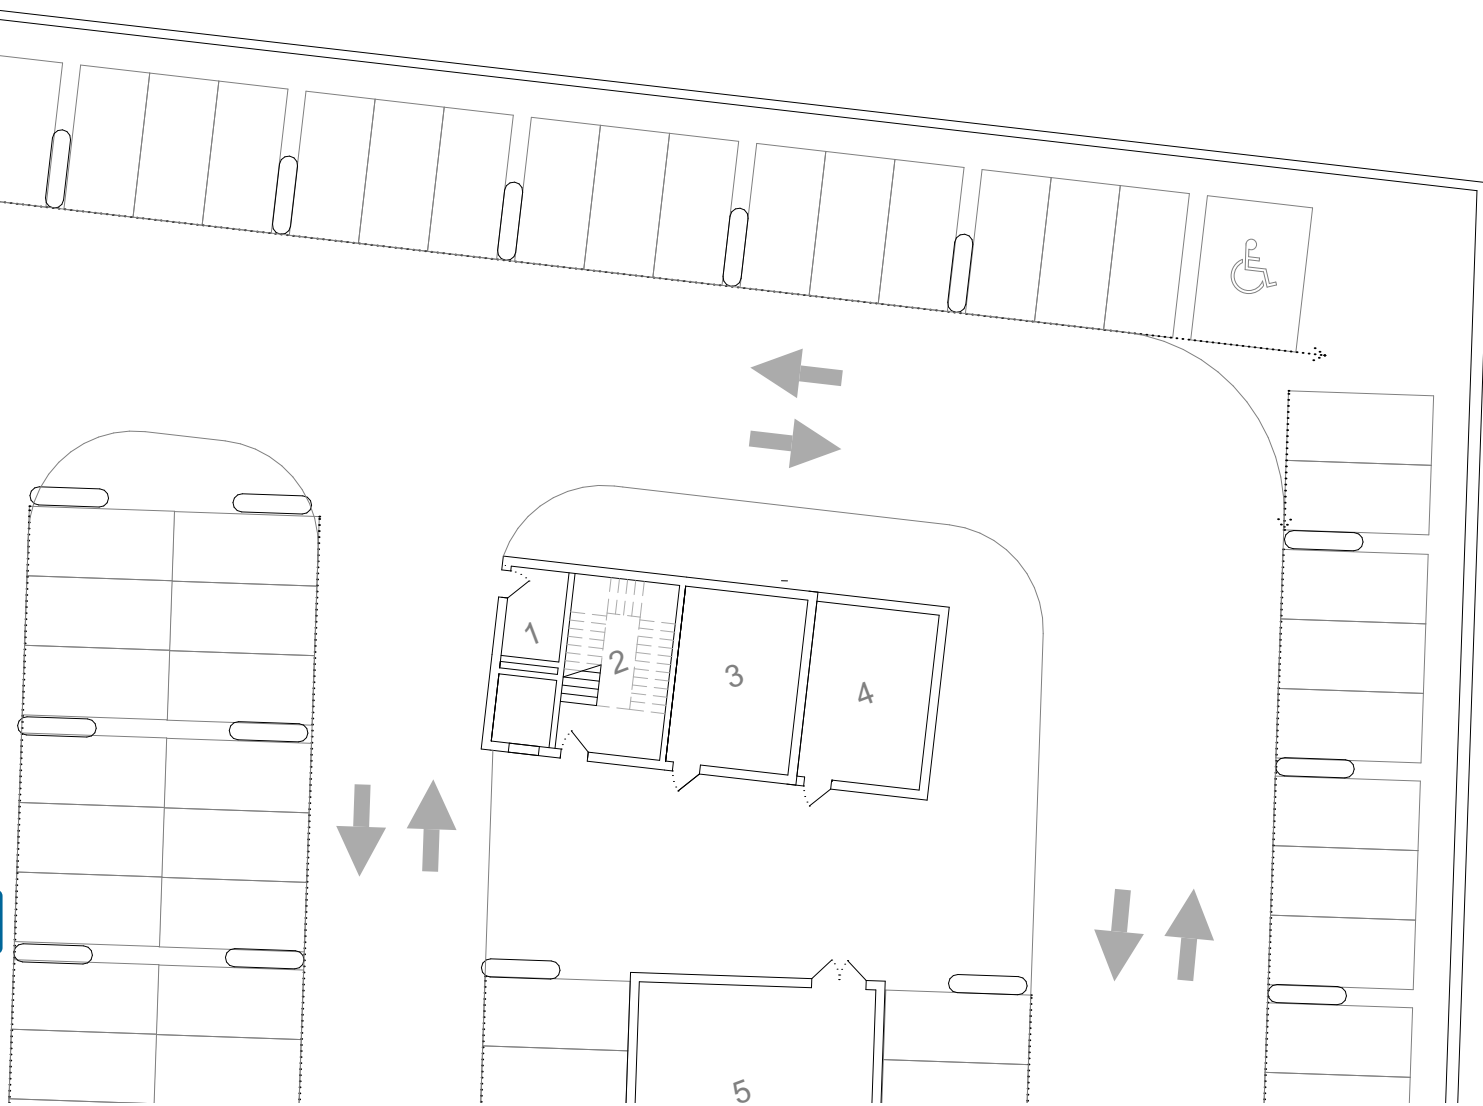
Floor plans: Second floor, 1:1250
